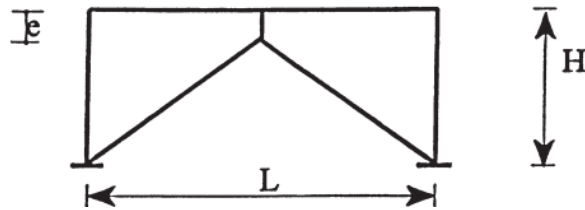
RC Bridge Bent Frame with Eccentric Bracing Systems (Ghobarah et al ,2001)
